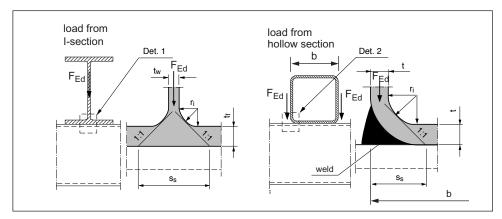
Length of stiff bearing when the concentrated load is applied from a hot rolled section or from a hollow section. Details
